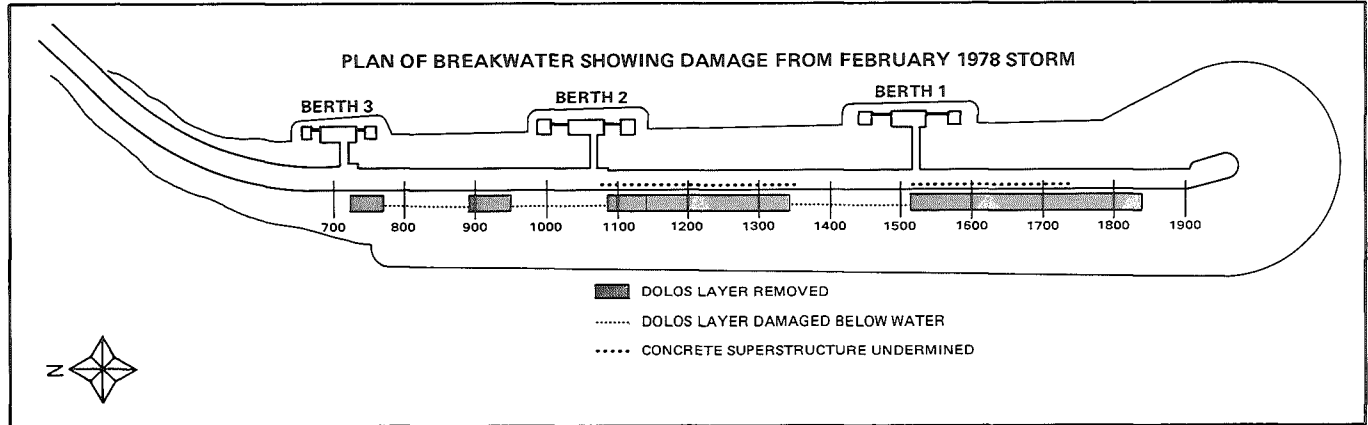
PLAN OF BREAKWATER SHOWING DAMAGE
